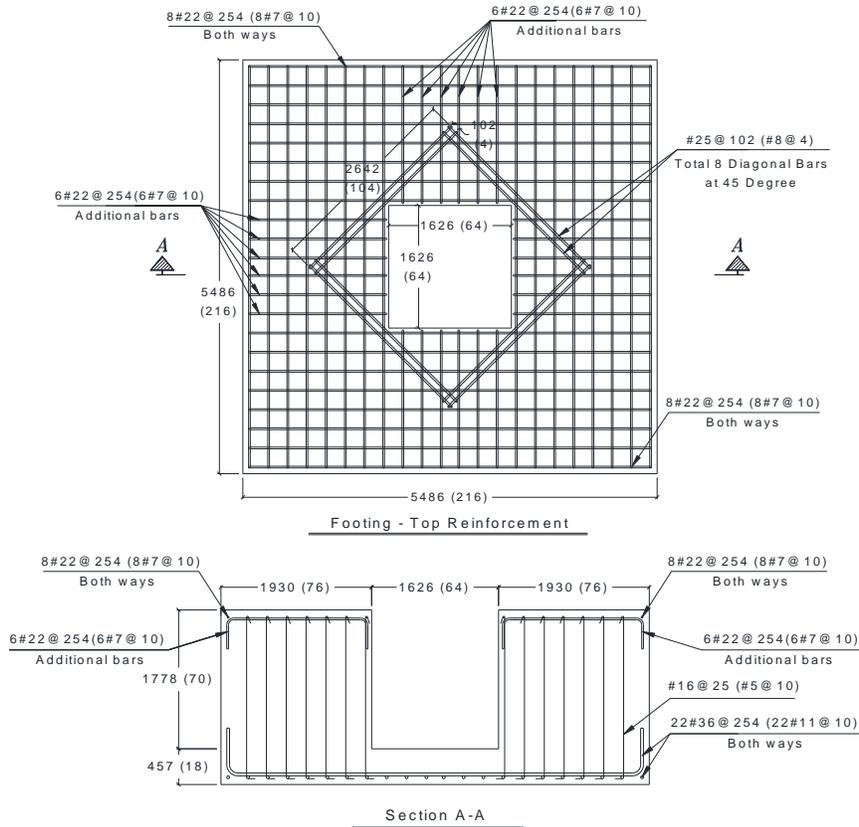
Details of square column-footing pocket connections [units are mm (in)]
